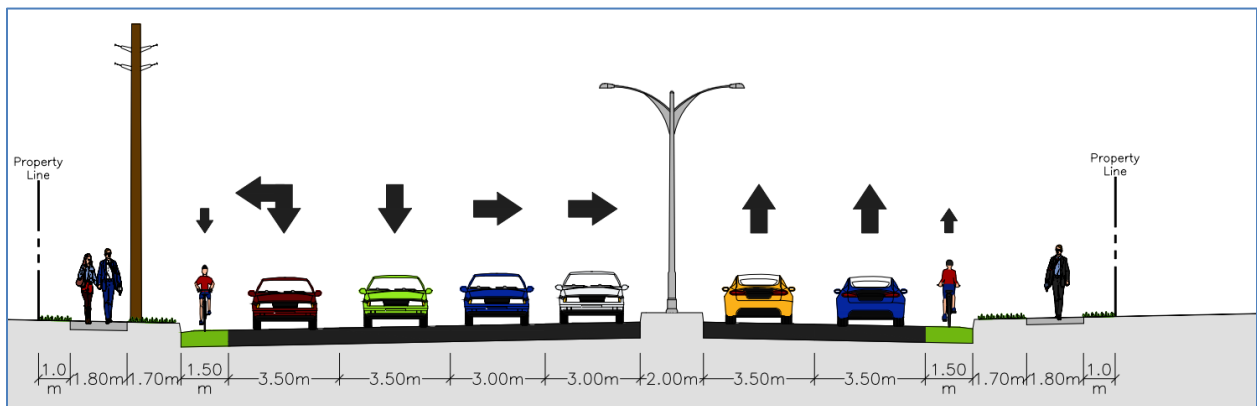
Preferred Design, Hamilton Road Cross-Section - East of Highbury Avenue
